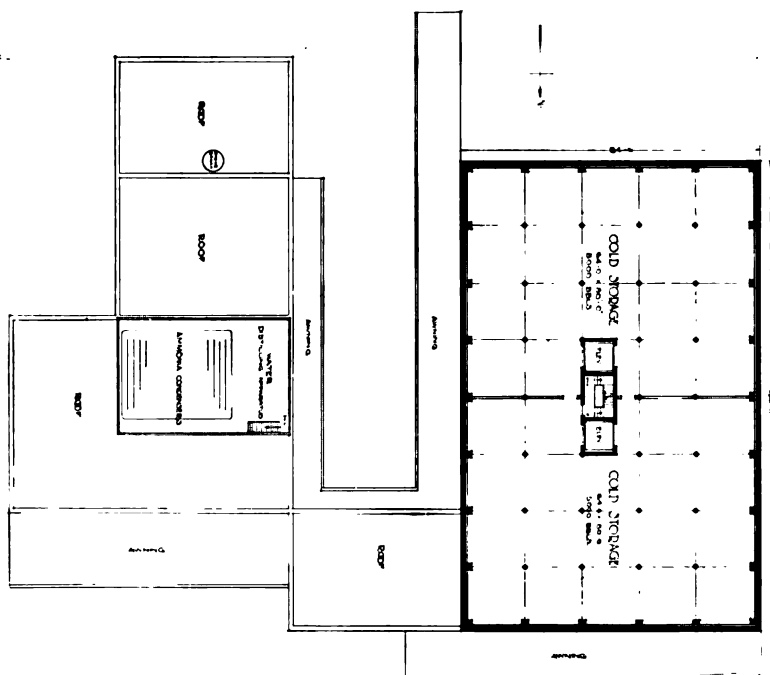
TYPICAL FLOOR PLAN—COLD STORAGE AND ICE MAKING PLANT.
